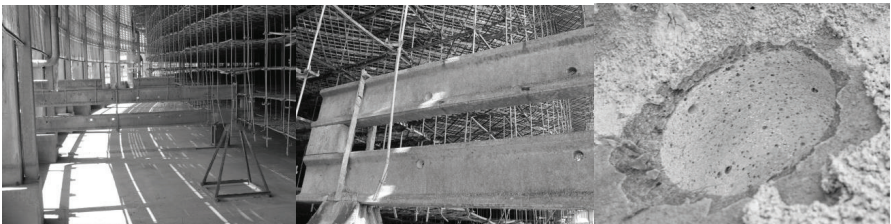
Situation of the beams in the cooling towers with location of the drilled specimens (no rust spots).
